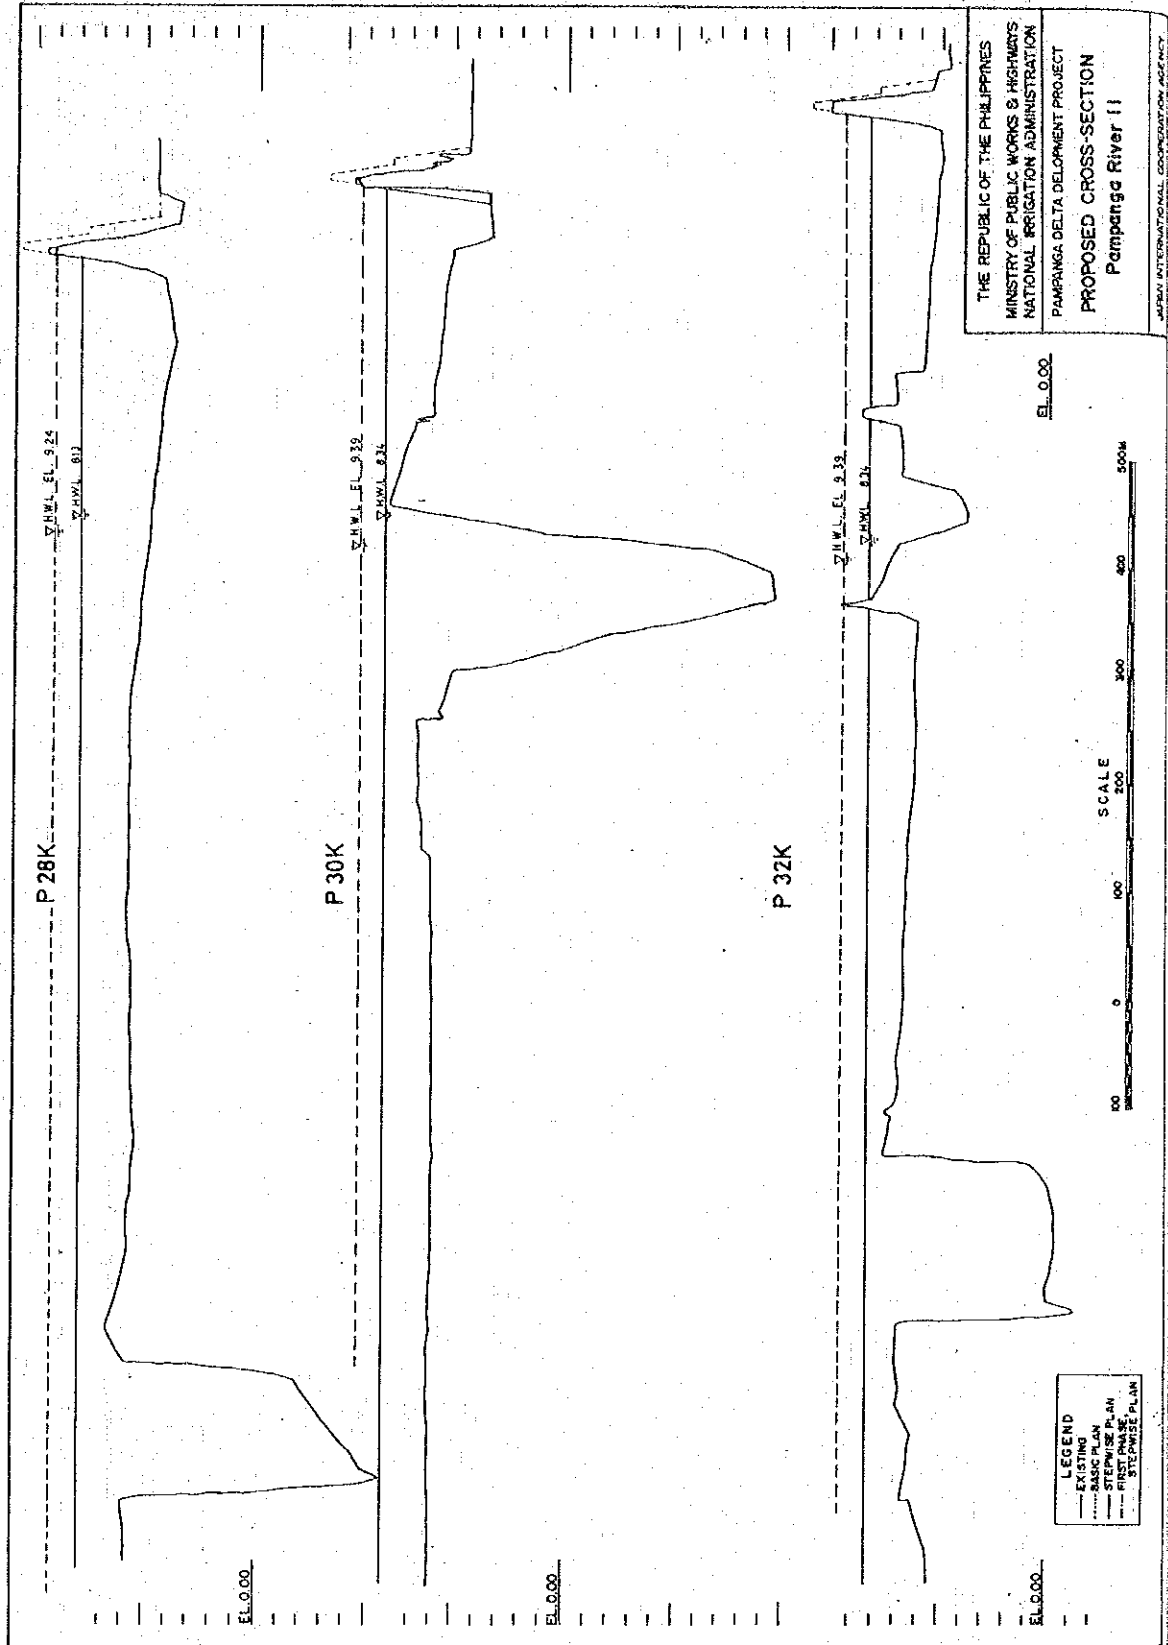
(12) PROPOSED CHANNEL CROSS-SECTION
